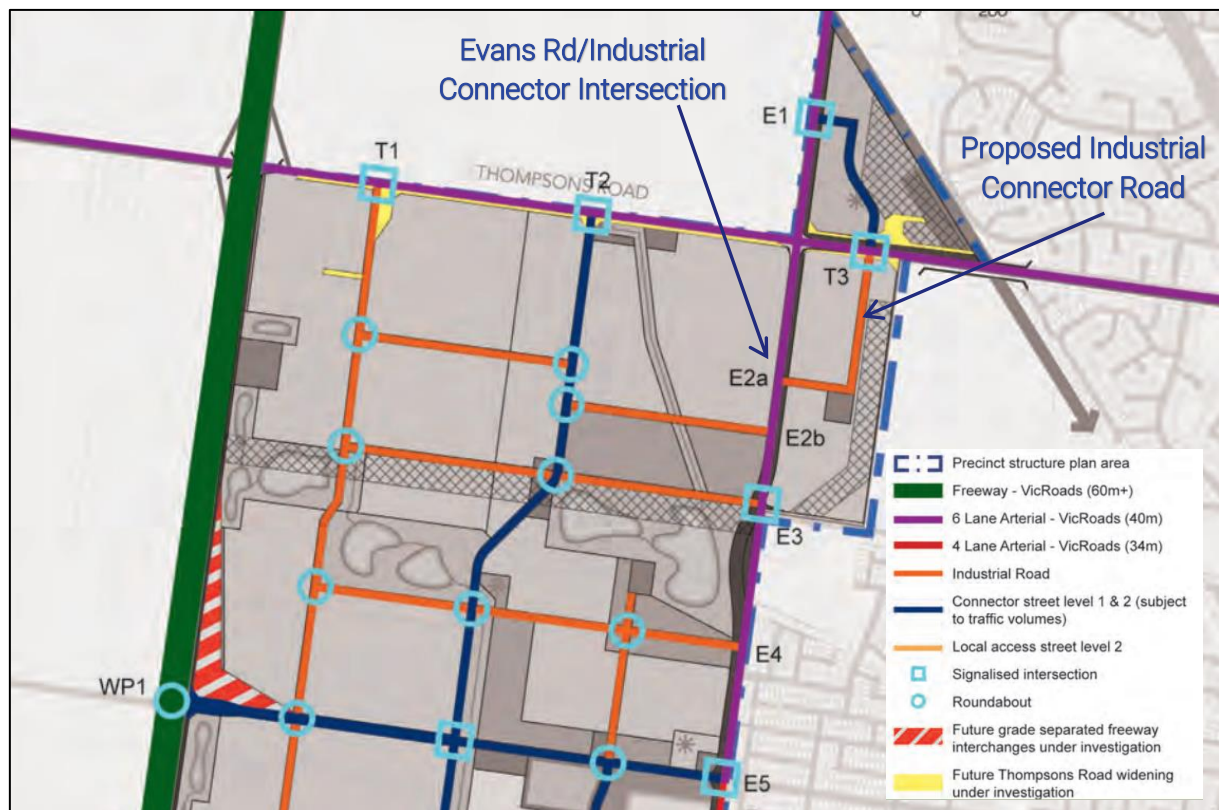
Extract from Plan 13 – Cranbourne West PSP
